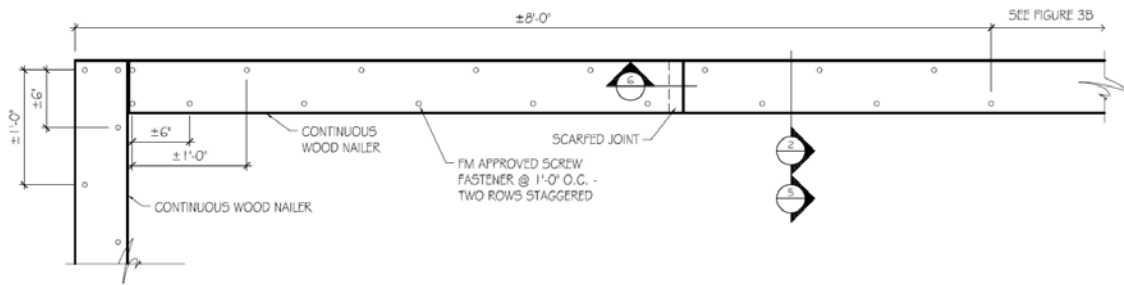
A - WOOD BLOCKING CORNER ANCHORAGE 8'-0" FROM CORNER
